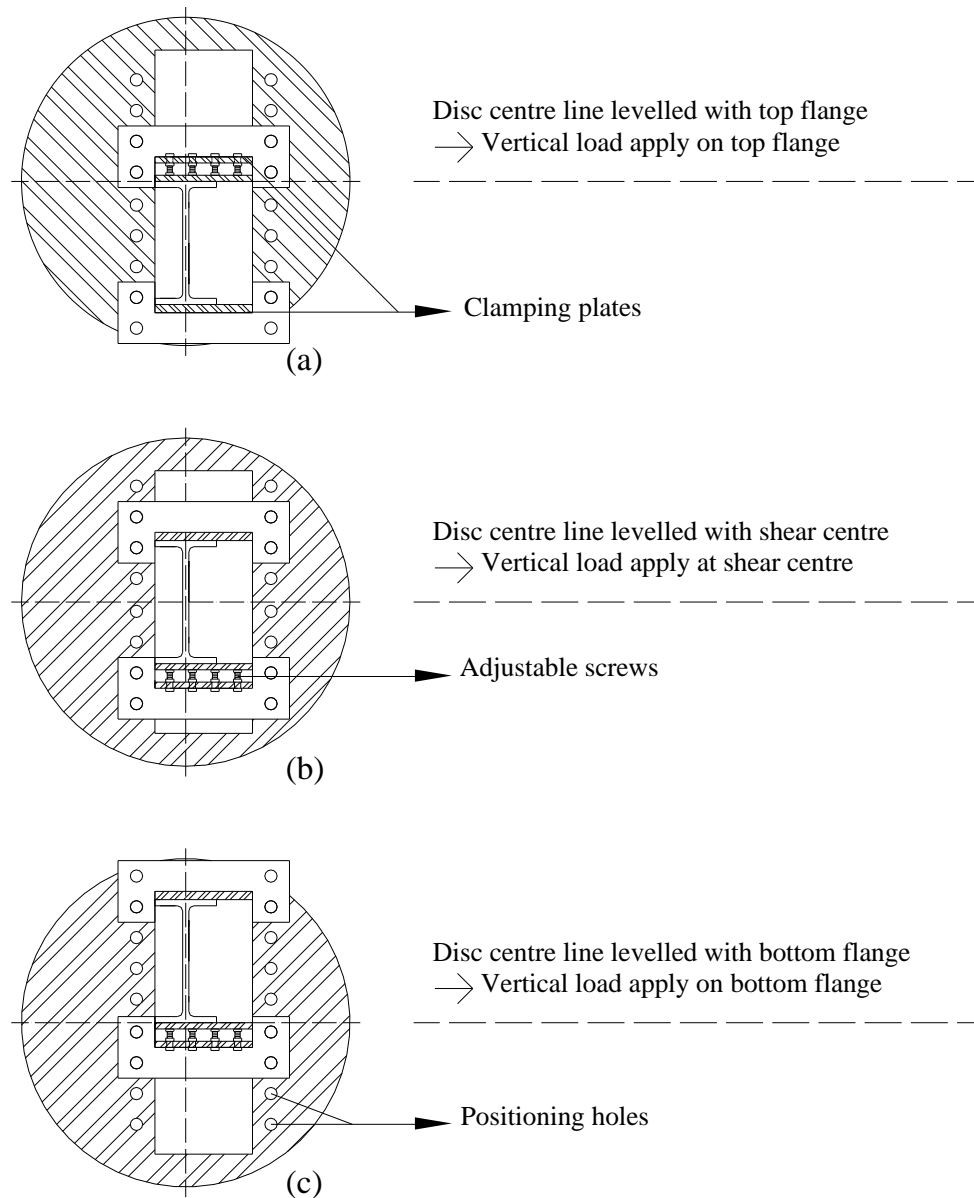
Three vertical load positions for: (a) Top flange; (b) Shear centre; (c) Bottom flange
